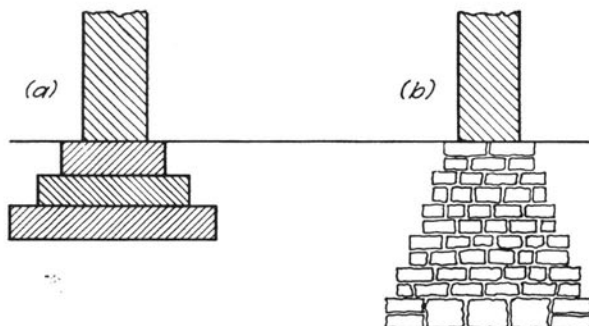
(a) TYPICAL FOOTING OF DIMENSION STONE;
